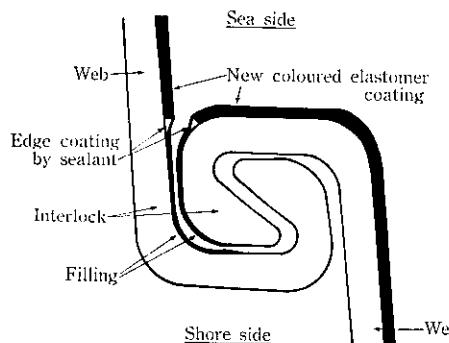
Coating method at interlock parts of new coloured polyurethane elastomer coated steel sheet piles
